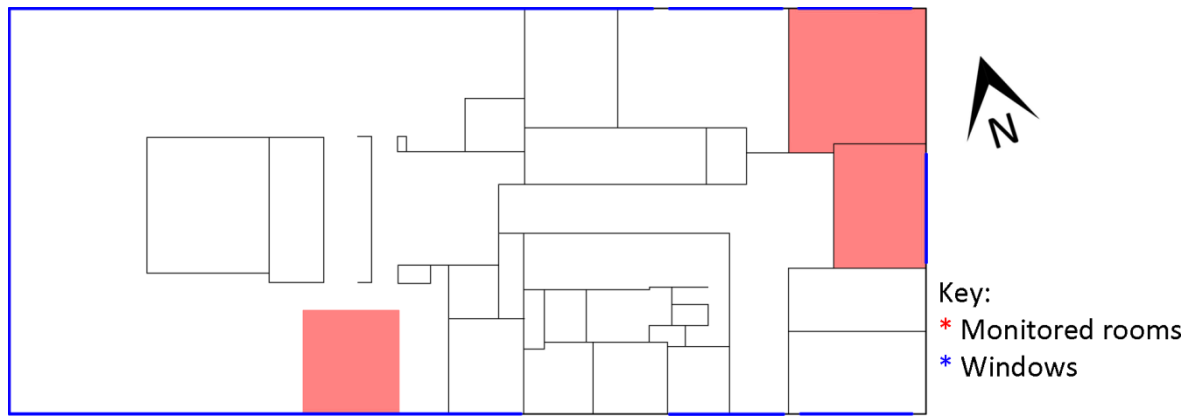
Floor plan illustrating level 11 in building 3 (Not to scale)
